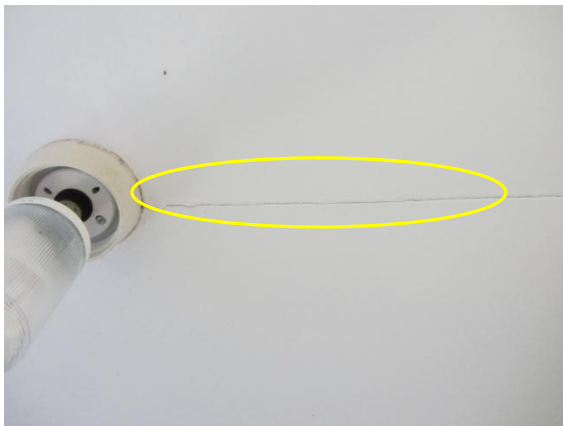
Hairline Cracking along Ceiling Lining Joints in Bathroom
